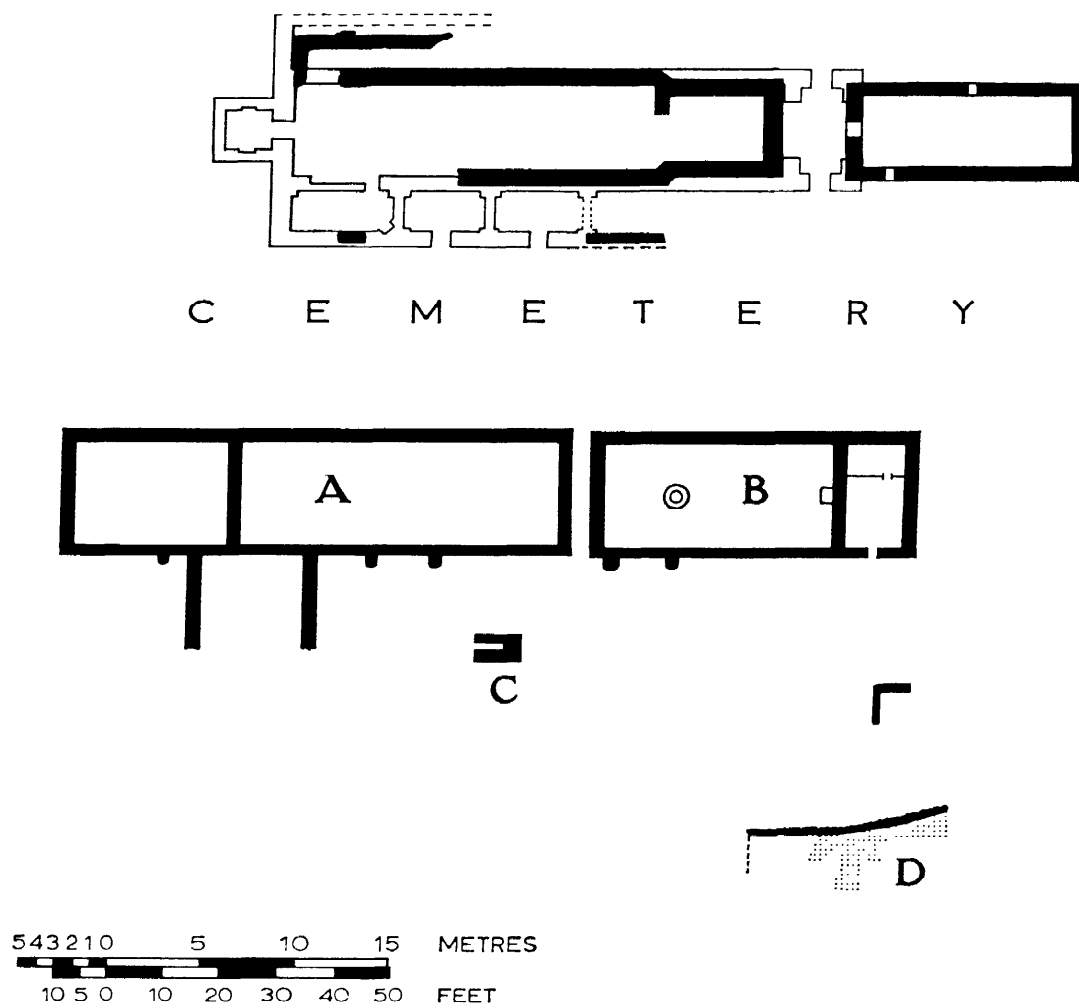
Jarrow Church: excavated features. Excavated foundations shown in relation to the 1769 British Museum plan and the outline of the 18th century church
